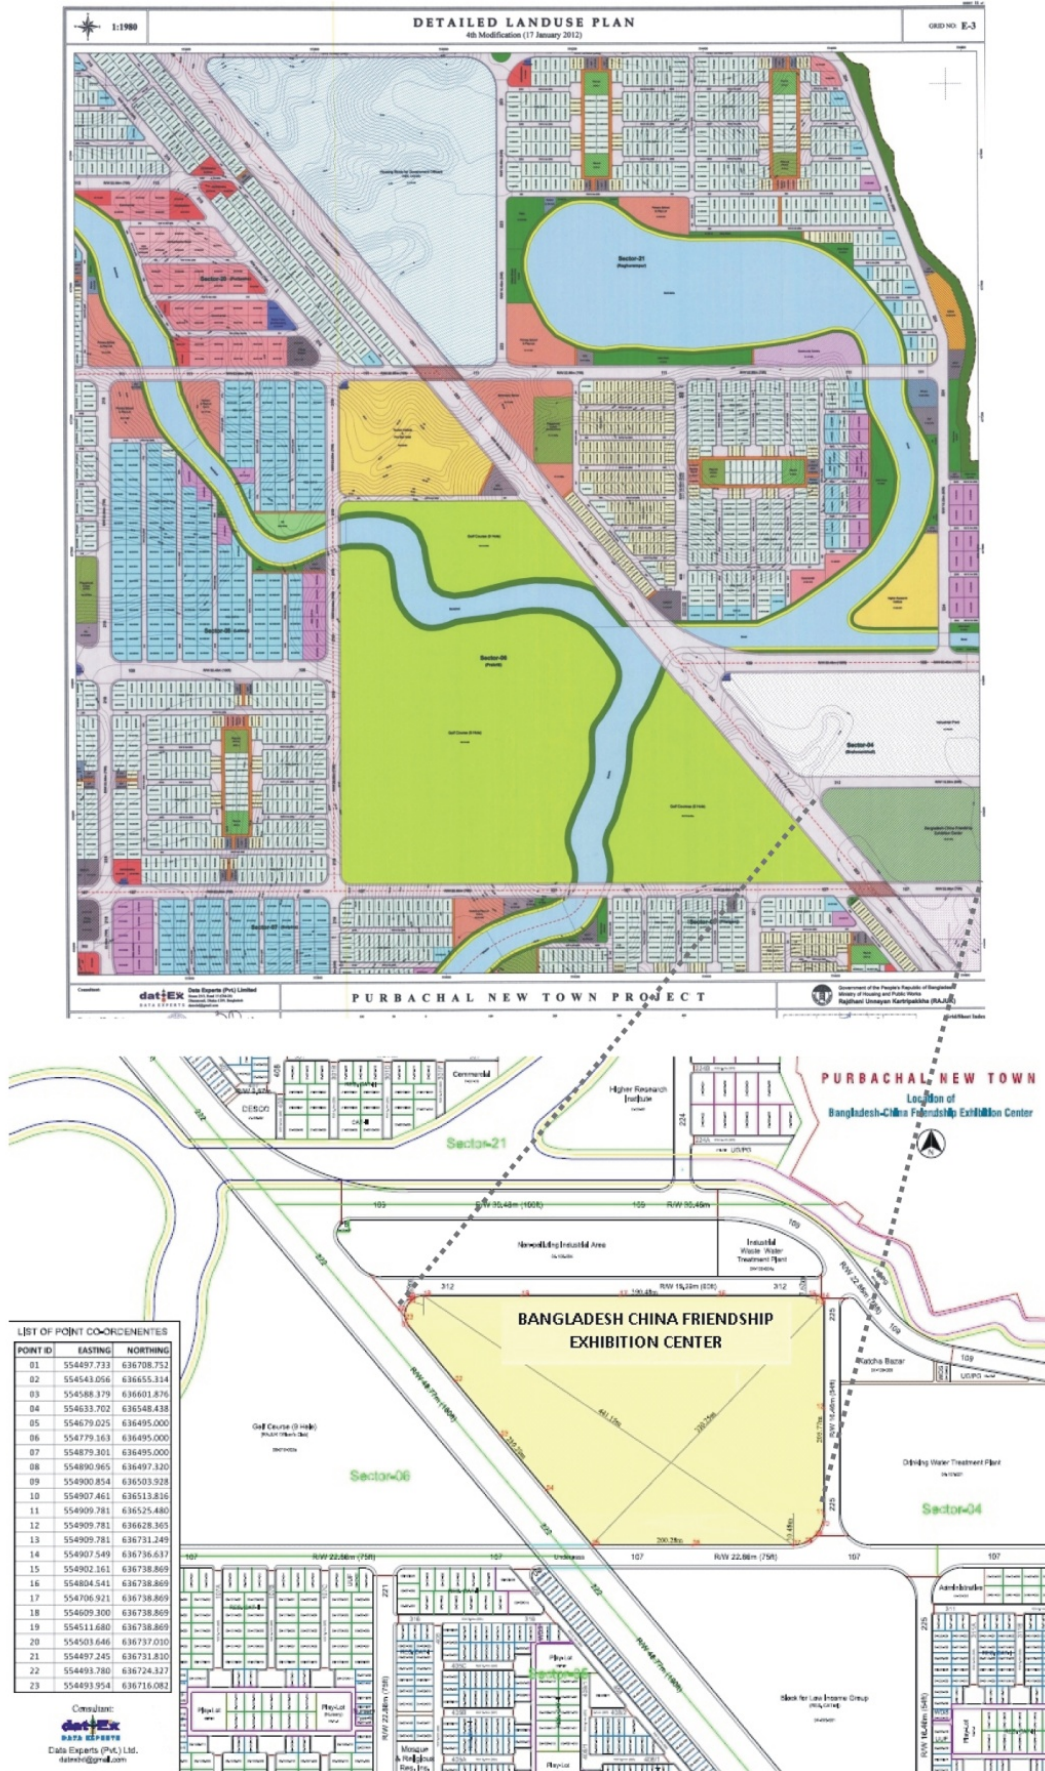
Detailed land use plan showing the site and the proposed site plan from EPB
